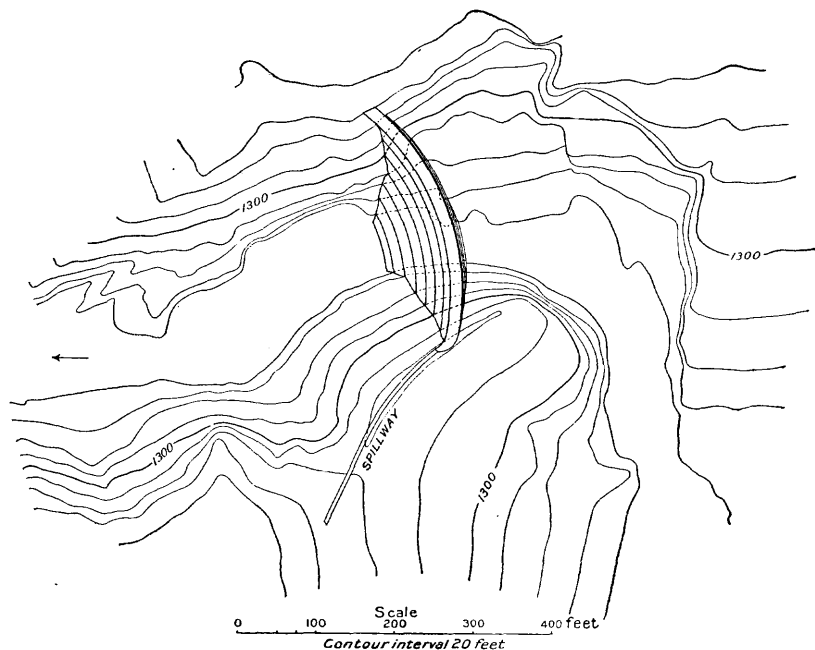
Gibraltar dam site, showing plan for 155-foot masonry dam.
